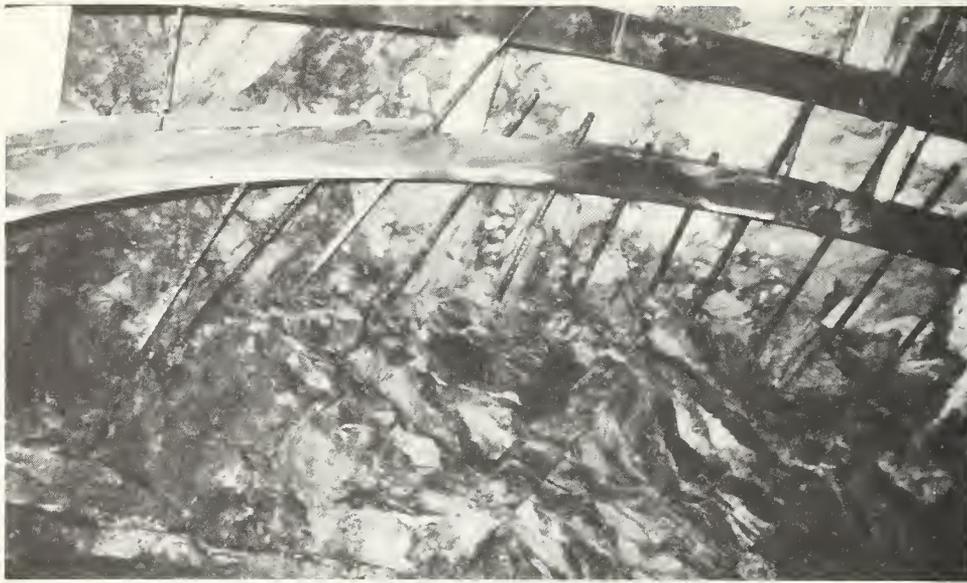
CROWN SPILING IN FULL FACE ROCK TUNNEL, APPROXIMATELY STATION 205+57 OB
